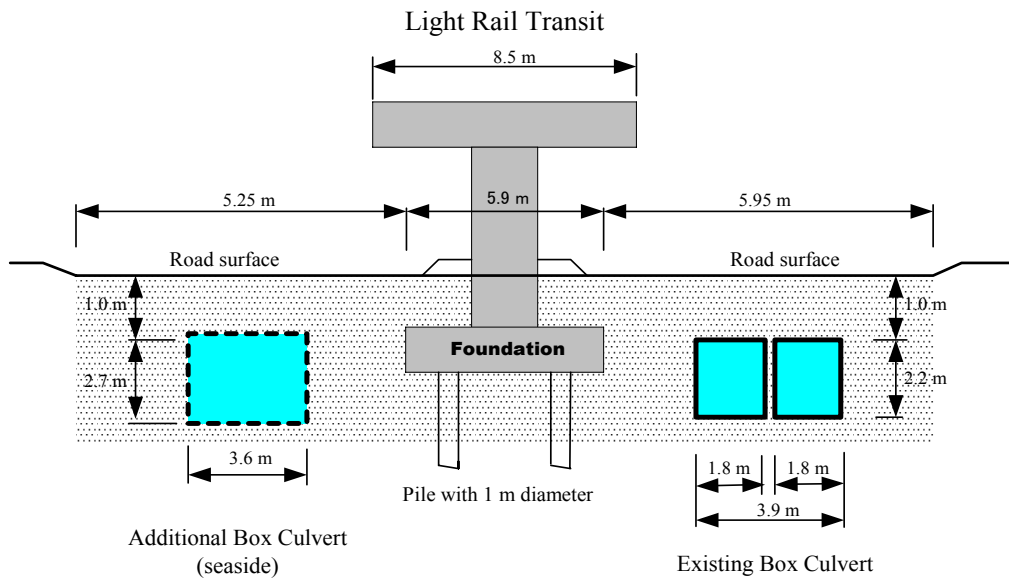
Image of Additional Box Culvert at Section of Rizal Avenue
